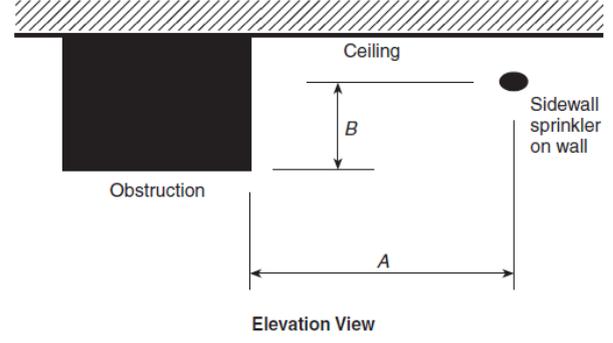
Positioning of Sprinklers to Avoid Obstructions Along the Wall (Residential Sidewall Sprinklers).
